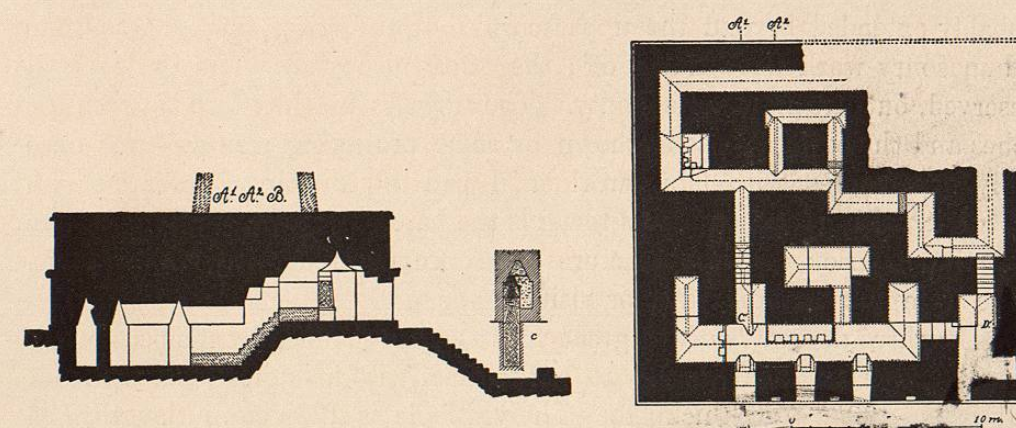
STRUCTURE 19 (THE LABYRINTH): SECTION AND GROUND-PLAN (RESERVED).
